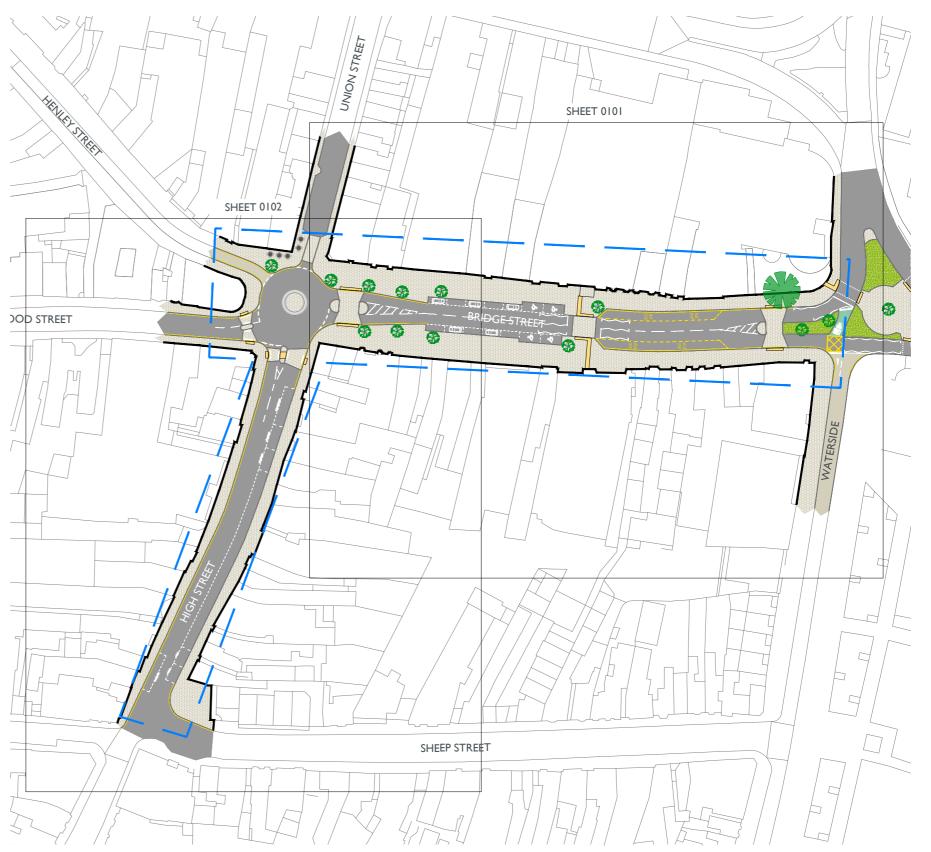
Option 1- Enhanced Street: General Arrangement Drawing
